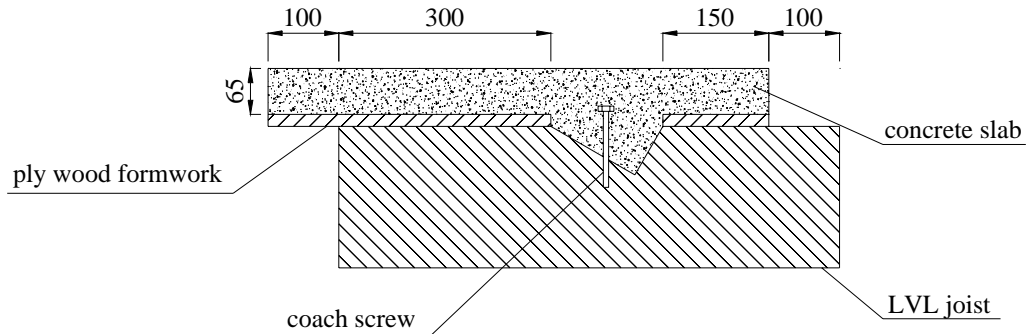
Typical geometry and components of a bird's-mouth shear connection
